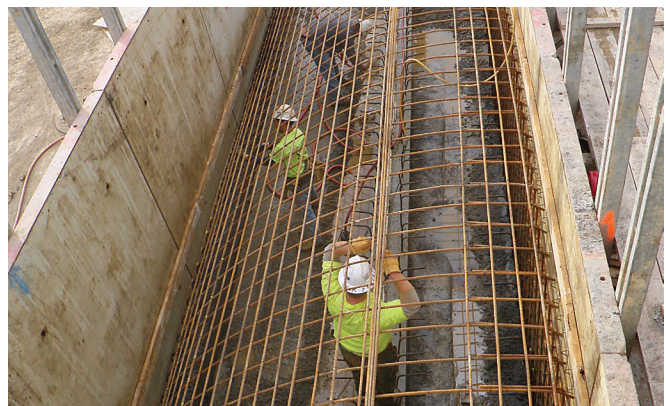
Top view of installation of reinforcement for ogee crest weir (Fox Creek MPS No. 4, KY).
